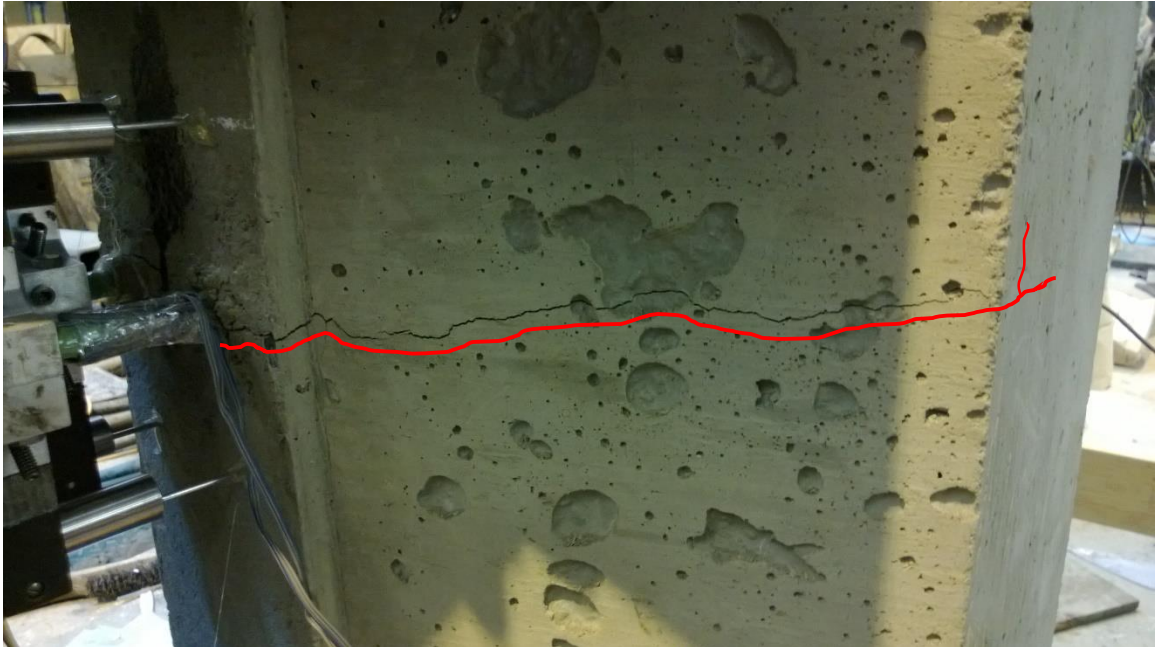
8.0M_WC_20A splitting cracks at failure on the angled face of the flange representative of typical concrete splitting failure with minimum applied compressive force.
